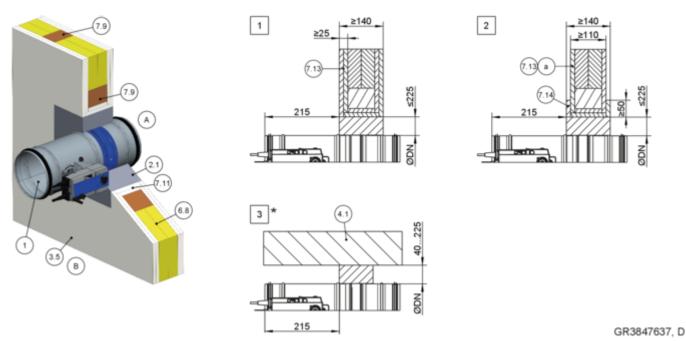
Mortar-based installation into a lightweight partition wall, half-timbered construction
